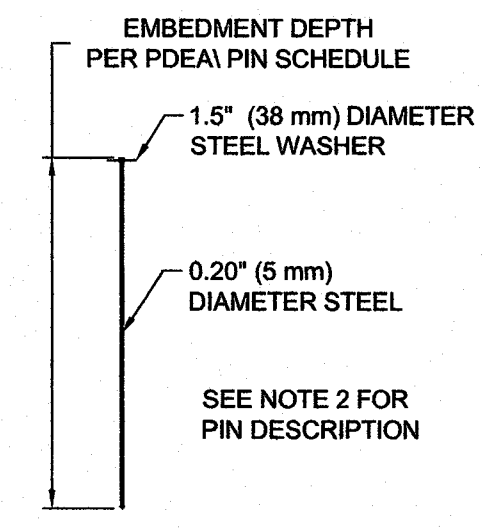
PERCUSSION DRIVEN EARTH ANCHOR (PDEA)
